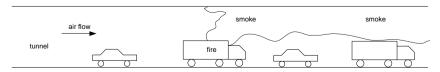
Fire ventilation in a tunnel with longitudinal ventilation.
